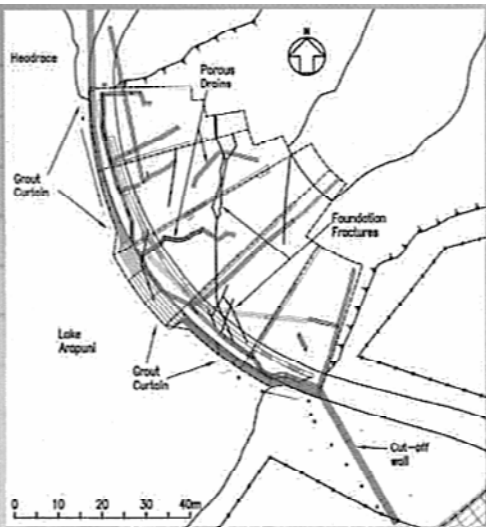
Plan view of Arapuni Dam (The positions of the foundation fractures noted during dam construction are shown).
